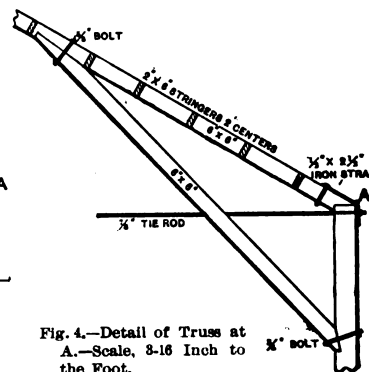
Detail of Truss at A.—Scale, 3-16 Inch to the Foot.
